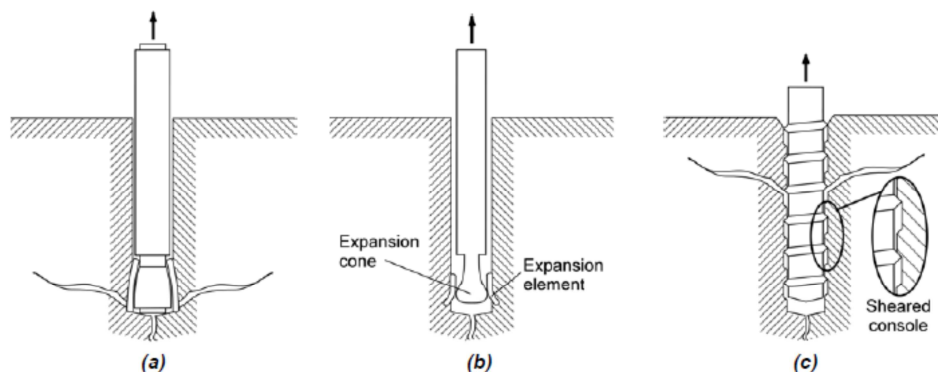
Failure modes: (a) sleeve-type expansion anchor (concrete cone); (b) bolt-type expansion anchor (pull-through); (c) screw anchor (pull-out/concrete cone) (Hoehler 2006)
